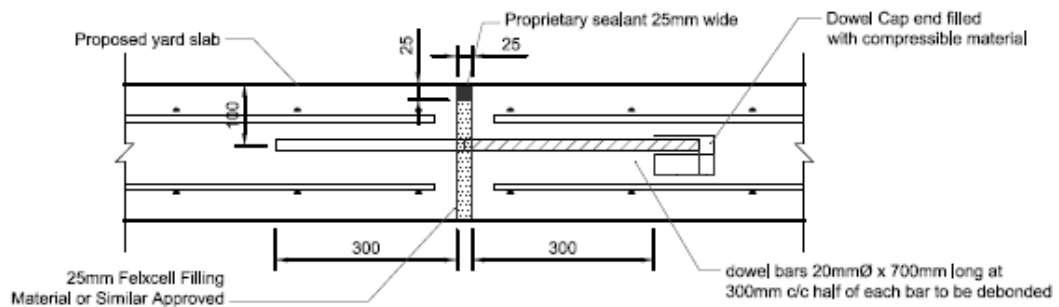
External Reinforced Concrete Slab – Expansion Joint
